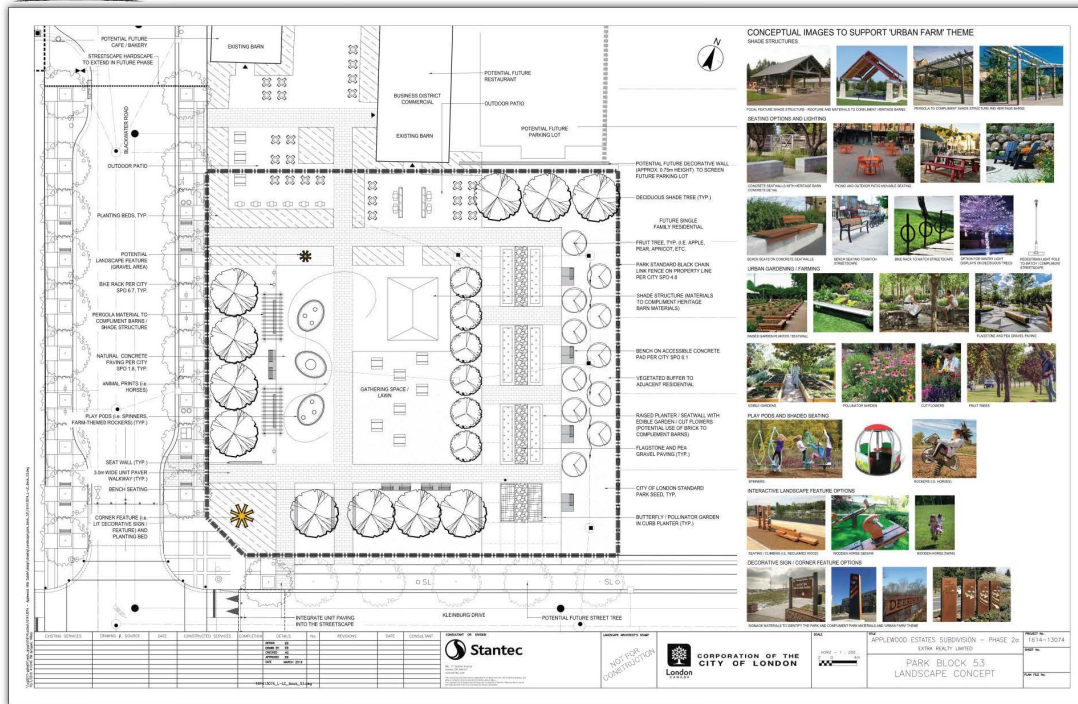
The Concept Plan for the park adjacent to the red barns at 660 Sunningdale Road East (2370 Blackwater Road). This Concept Plan is subject to change, but is included to demonstrate the efforts to connect the barns to the adjacent park space.
